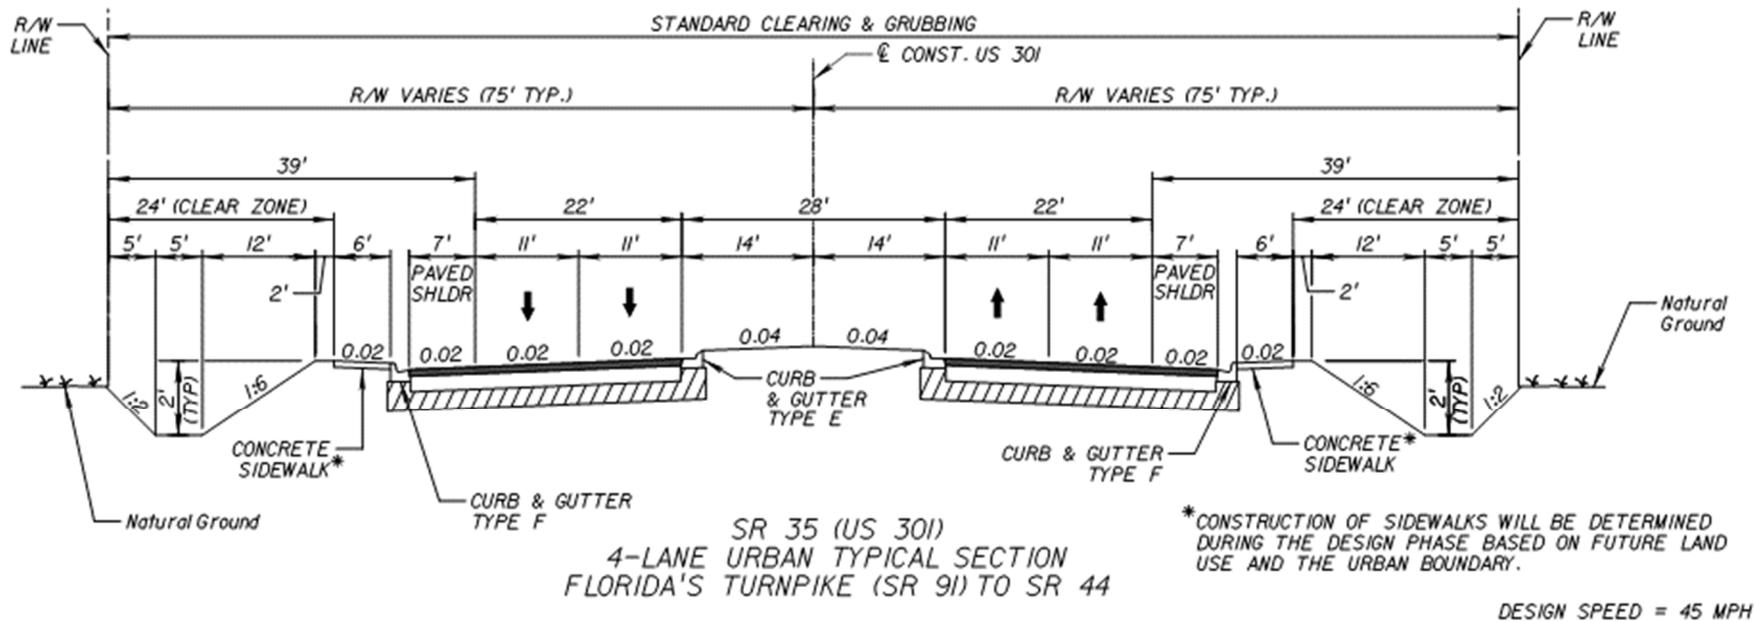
| Recommended Urban Typical Section – Segment 5
